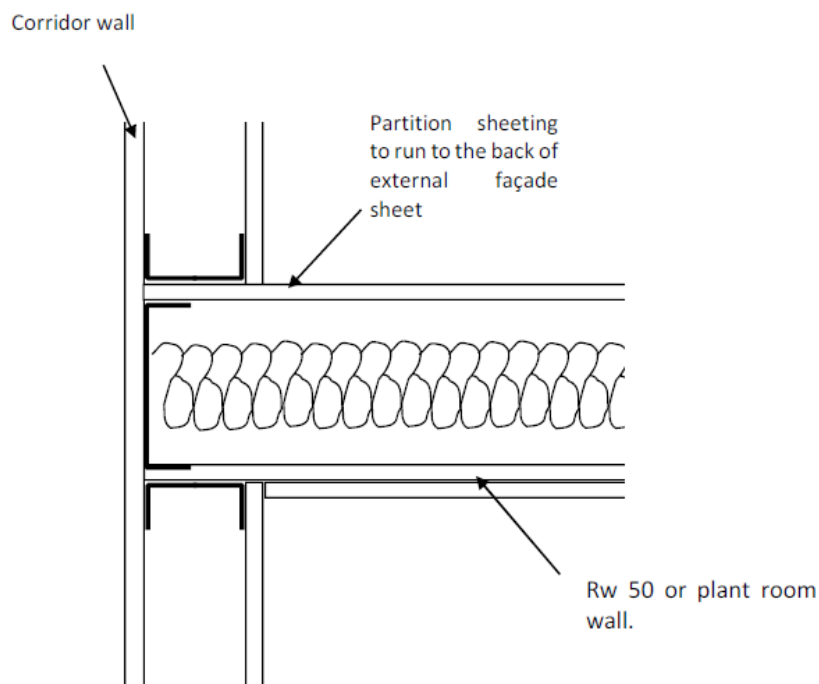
Rw50 (Plant Room Wall to Corridor Wall Junction) Wall Construction
